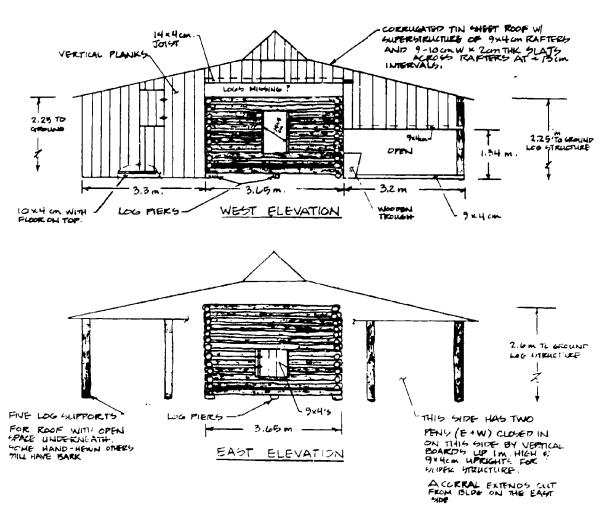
Field architectural drawings of the log crib at 41DN107. (a) west elevation, (b) east elevation.
